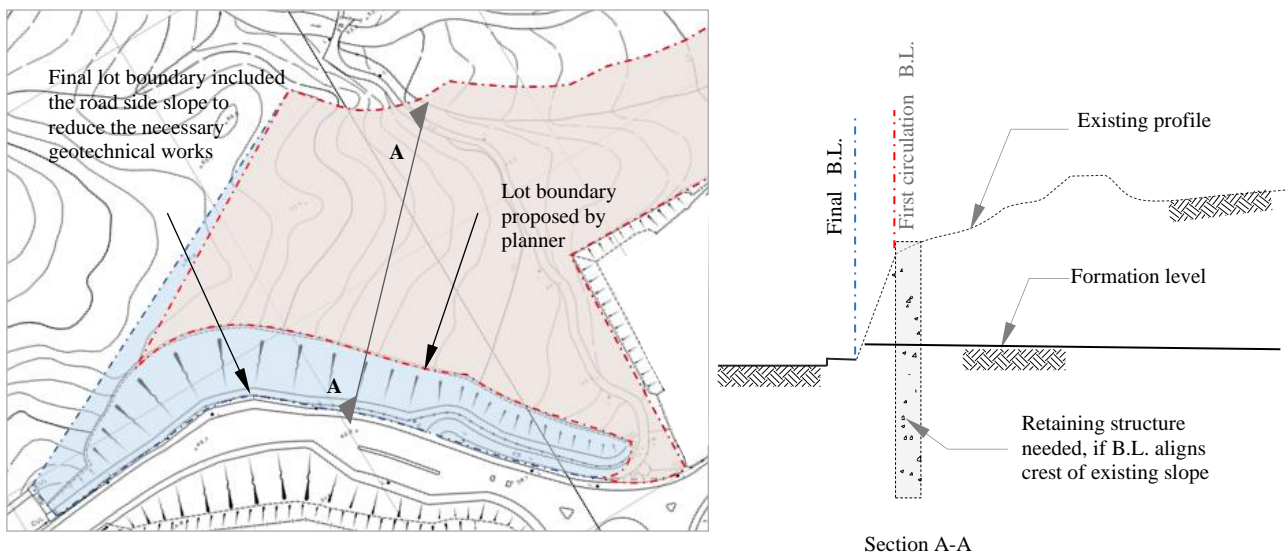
Smarter planning of the site layout and lot boundary to minimize the geotechnical works necessary for the development
